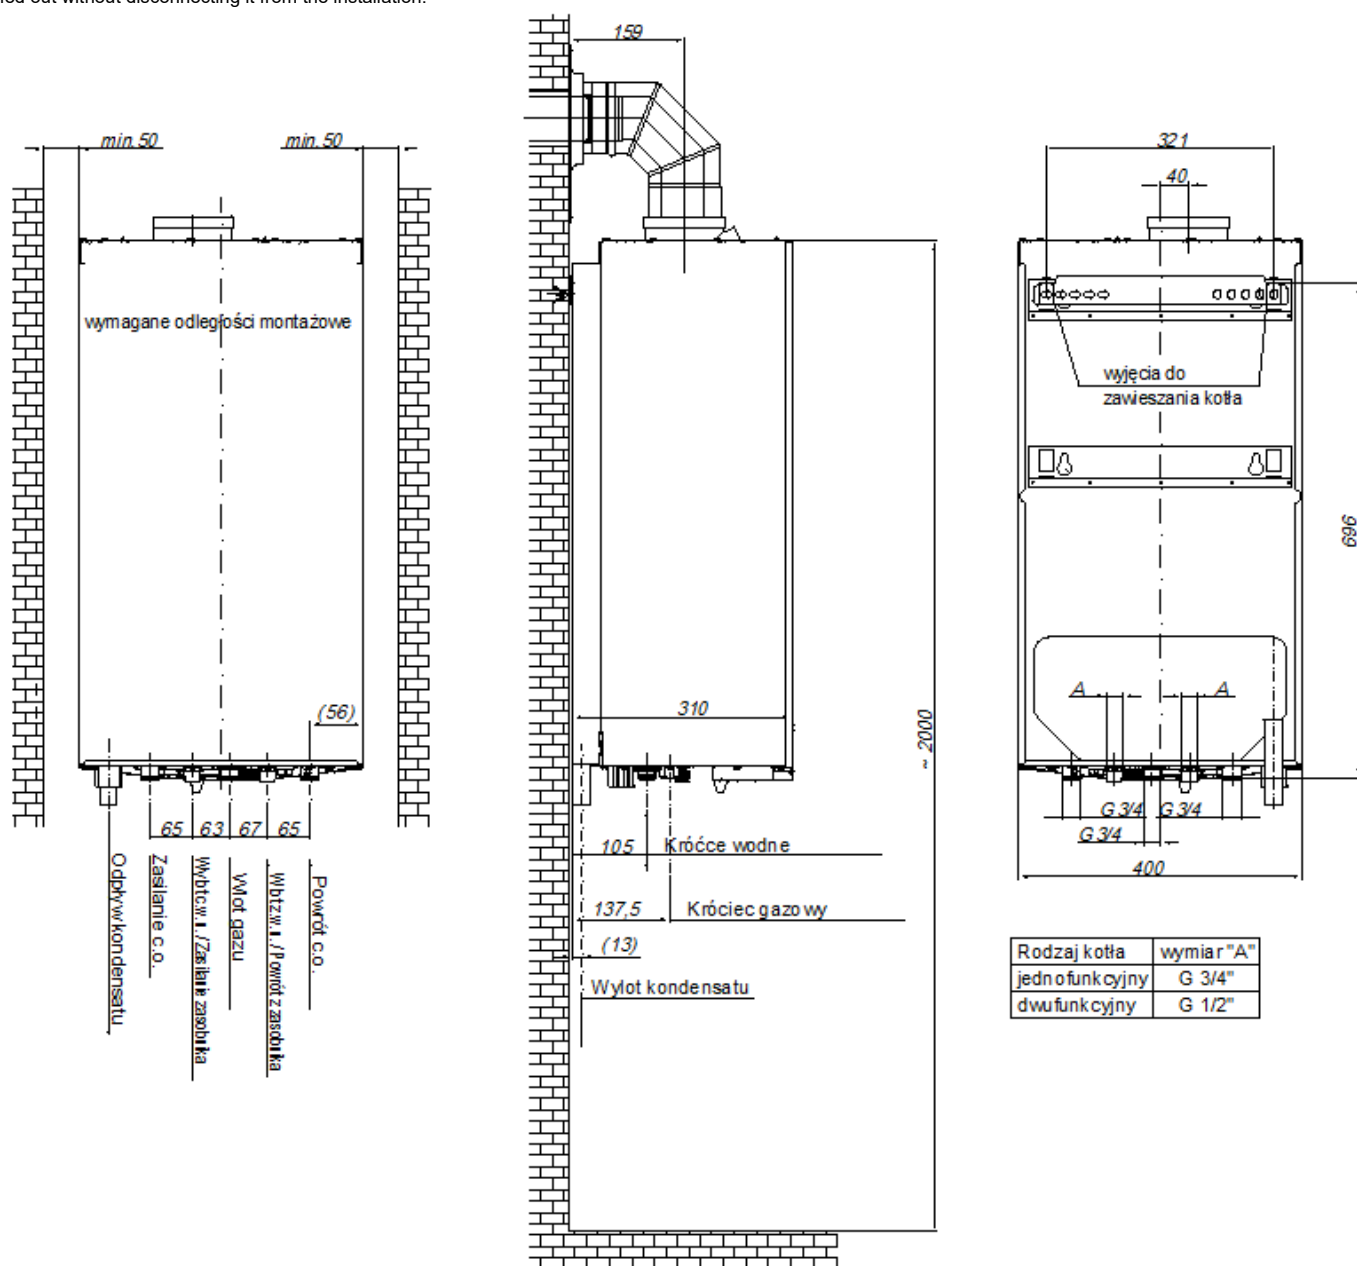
GCB-S57, GCB-C57 boilers installation dimensions
